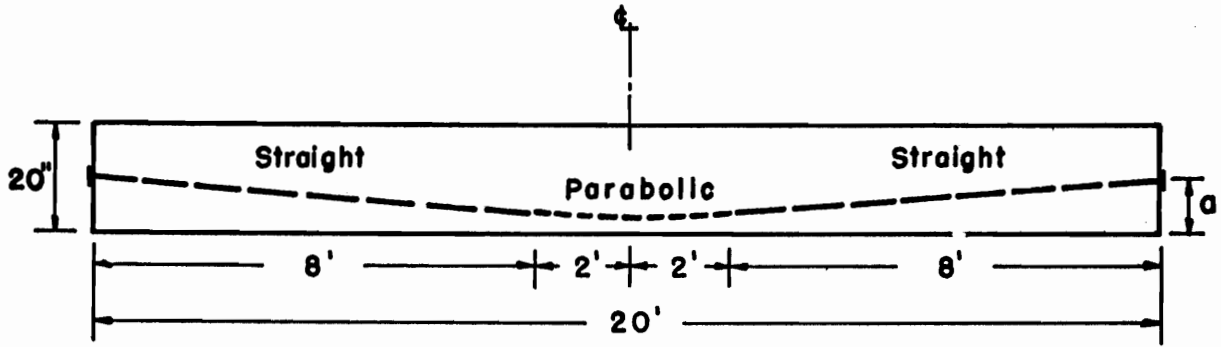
A ELEVATION OF CABLE LAYOUT FOR ALL BEAMS
